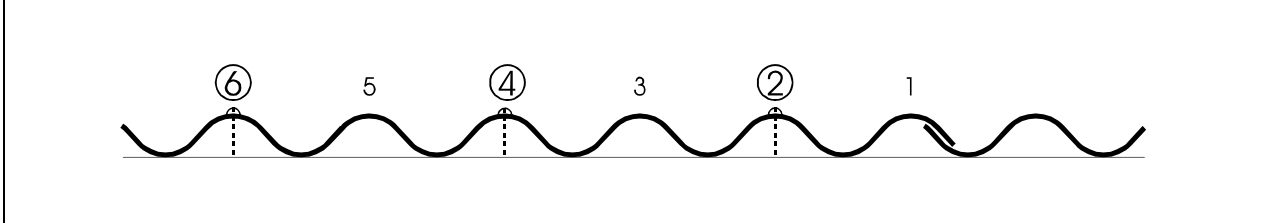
Hook bolts or cylindrical screws at the edges of the roof
